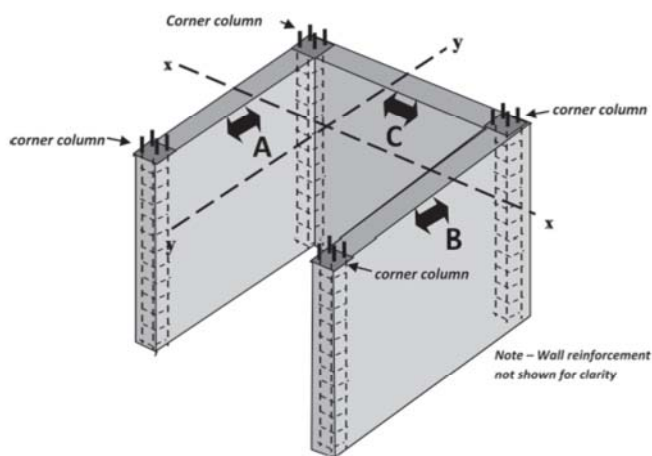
Typical core wall showing embedded corner columns.
